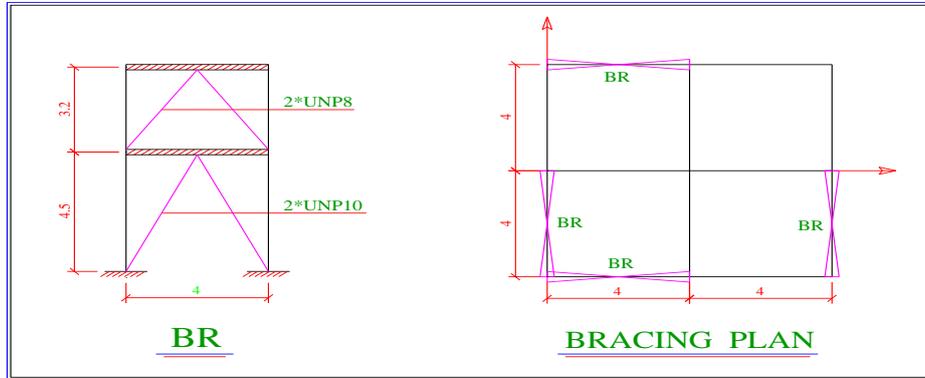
Bracing plan and Bracing elevation of a commercial building, (UNP represents the cross-section of the braces' profile)
